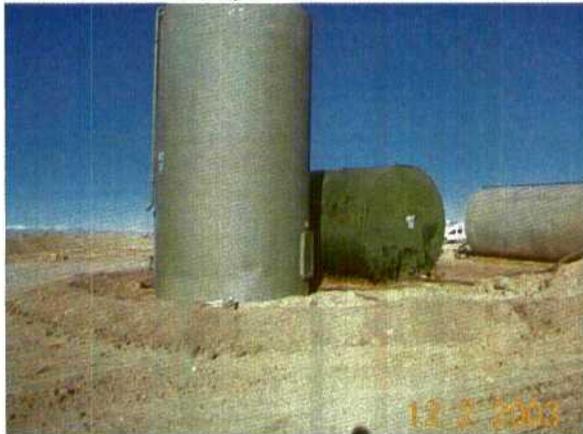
Tanks are bermed however the volume of the containment area does not appear to be able to contain 1 1/3 the volume of the largest tank.
